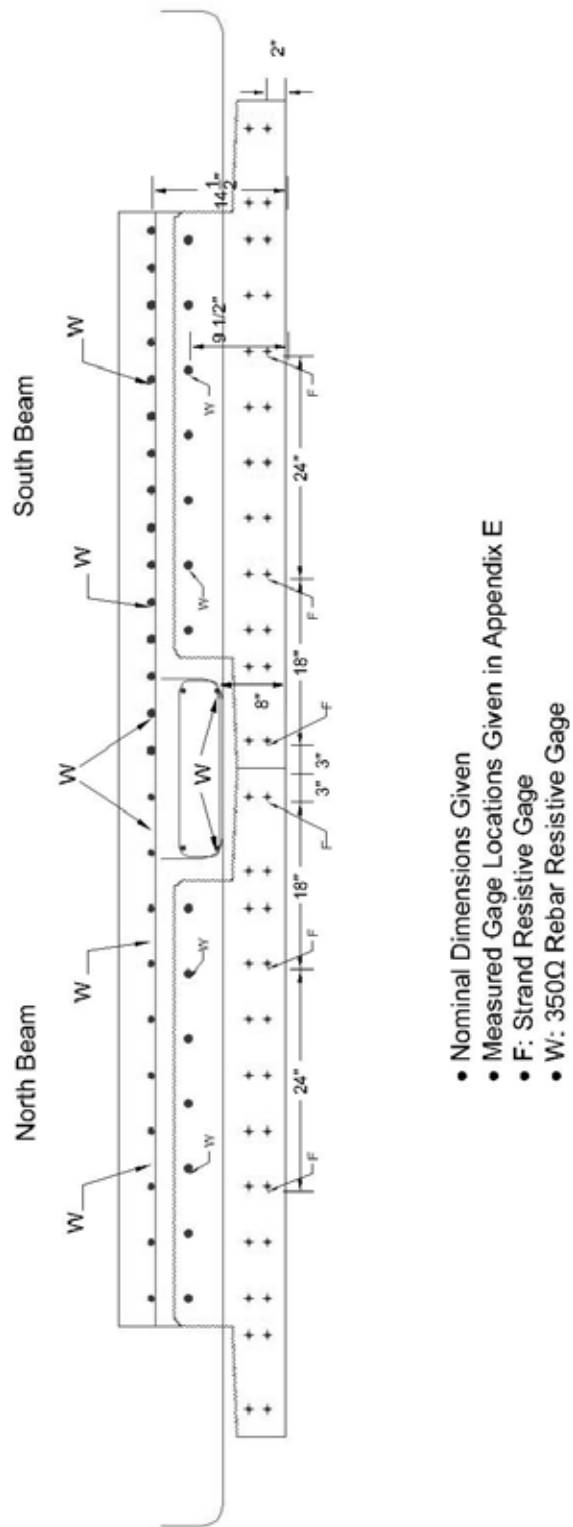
Longitudinal instrumentation layout within the cross section at quarter spans
